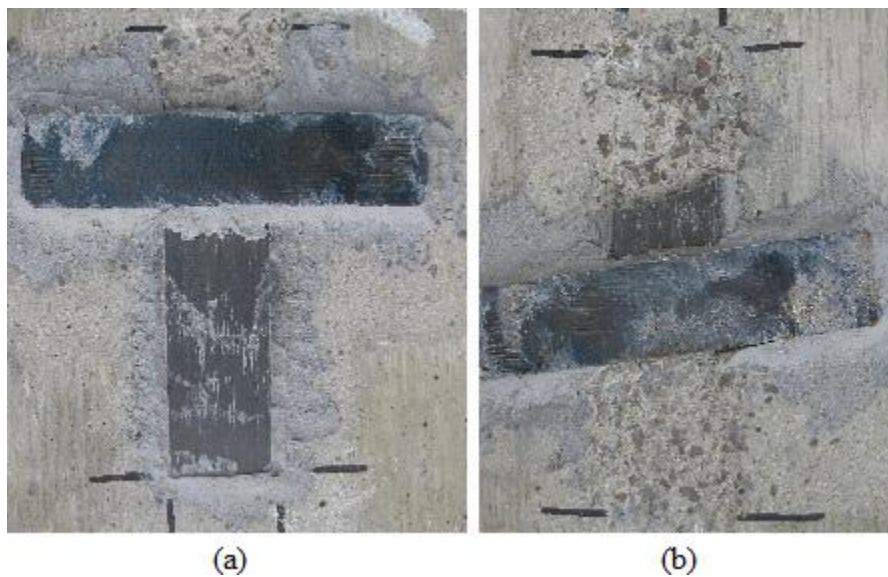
Failure planes of DS7 (a) Bottom south face and (b) top north face
